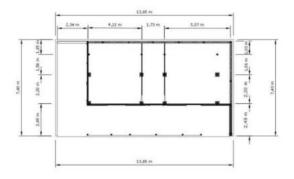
Taneyan Lanjhang house building plan Source: Research team, 2023
